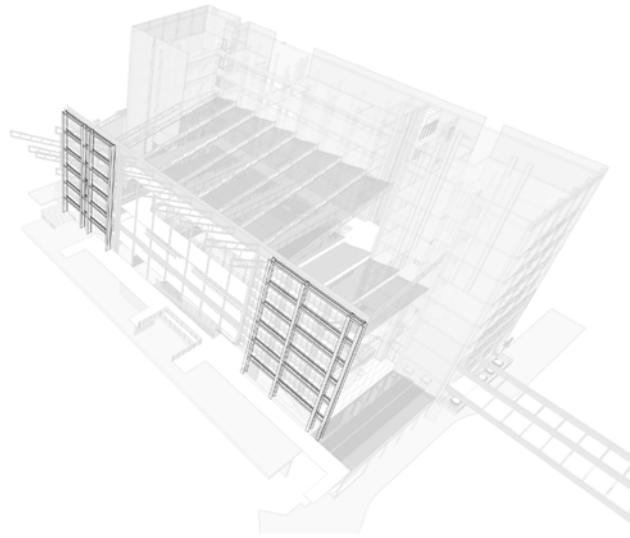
Primary structure: vertical steel columns stiffened by horizontal channels.
